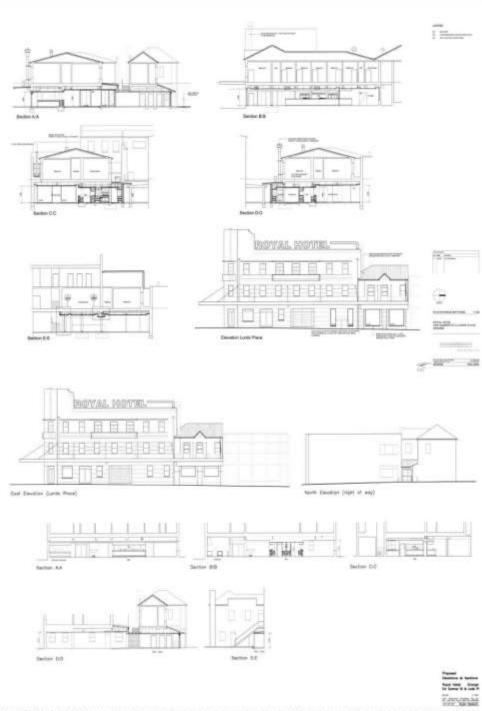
| John Blackwood Architects elevations and sections for the 2003 proposed alterations to kitchens and bars at the Royal Hotel. [Orange City Council]
